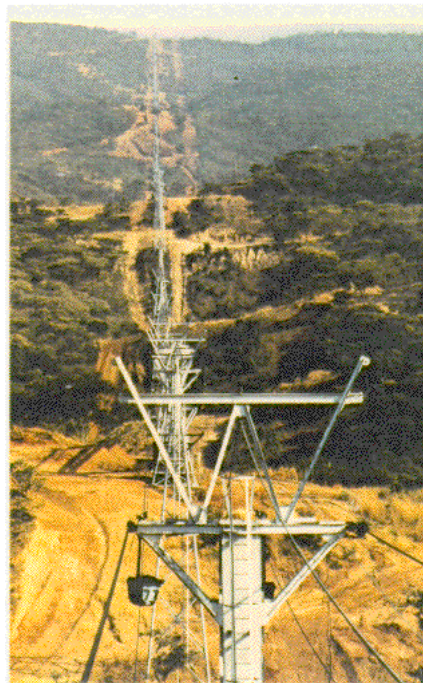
Aerial ropeway (Source: John T.B – 1993 (9))
